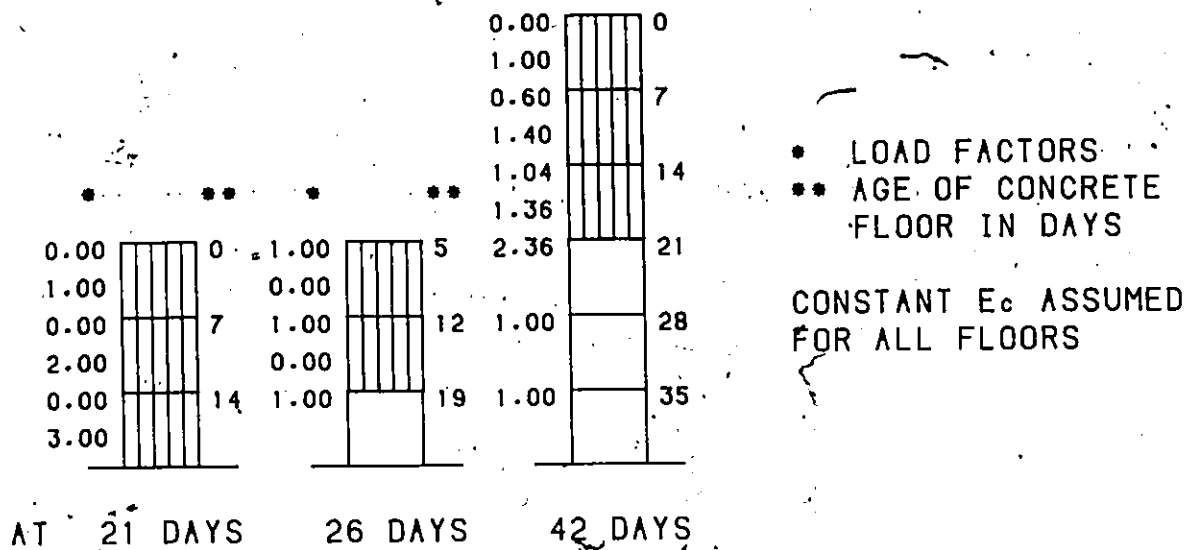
TYPICAL LOAD DISTRIBUTIONS ON CONCRETE FLOORS [54]
